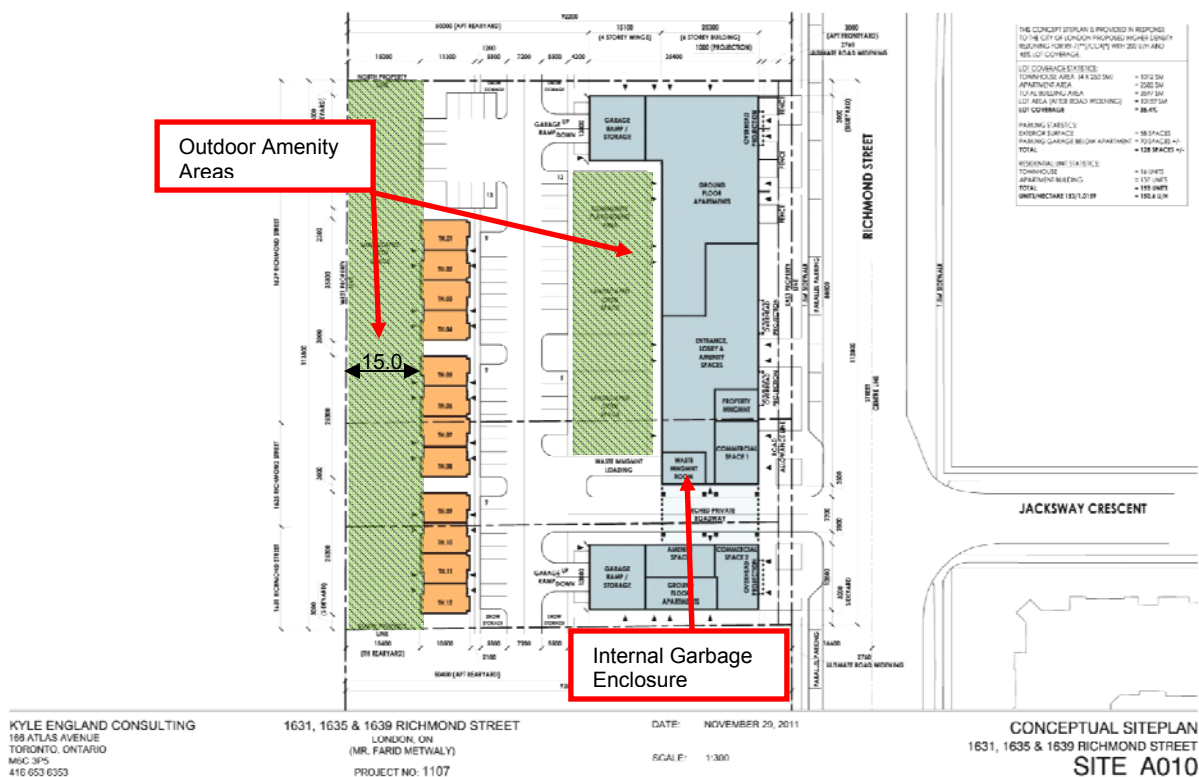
Site plan drawing for the development of the properties located at 1631, 1635, and 1639 Richmond Street
